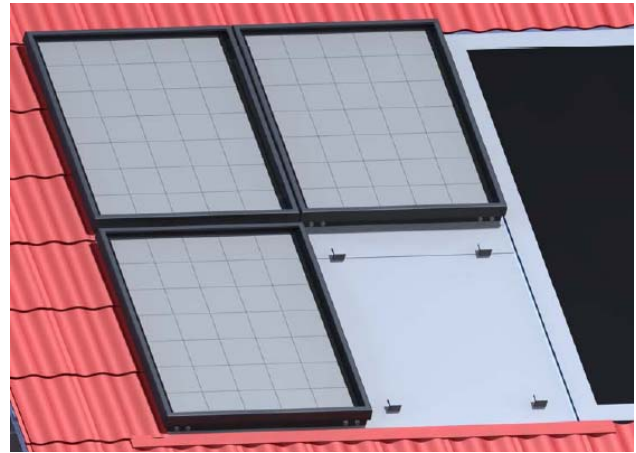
The PVT panels are placed on waterproof plates attached to the roof.
